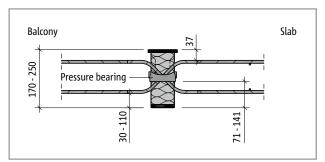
Schöck Isokorb® T type Q-E-VV5: Product section
